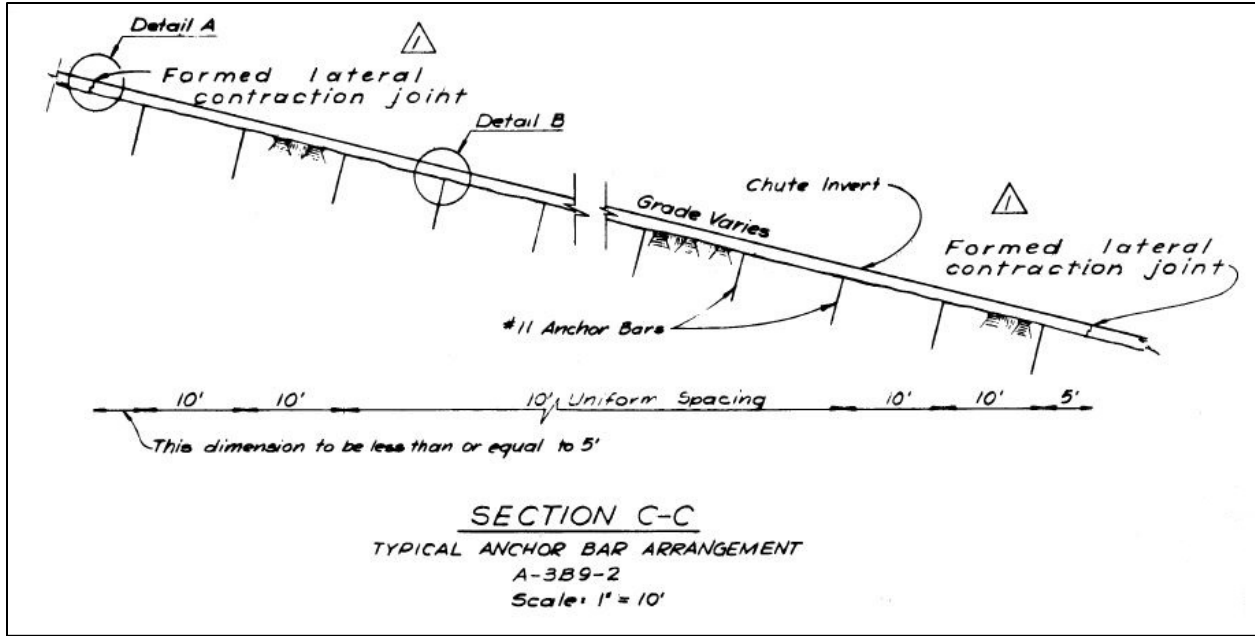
Spillway Chute Anchor Bar Arrangement Showing Transverse Invert Contraction Joints (from Drawing A-3B9-4)
